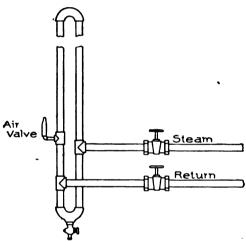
Loop of Steam Pipe to be Run Inside Flue. Connected for Drainage and Air-Venting.
